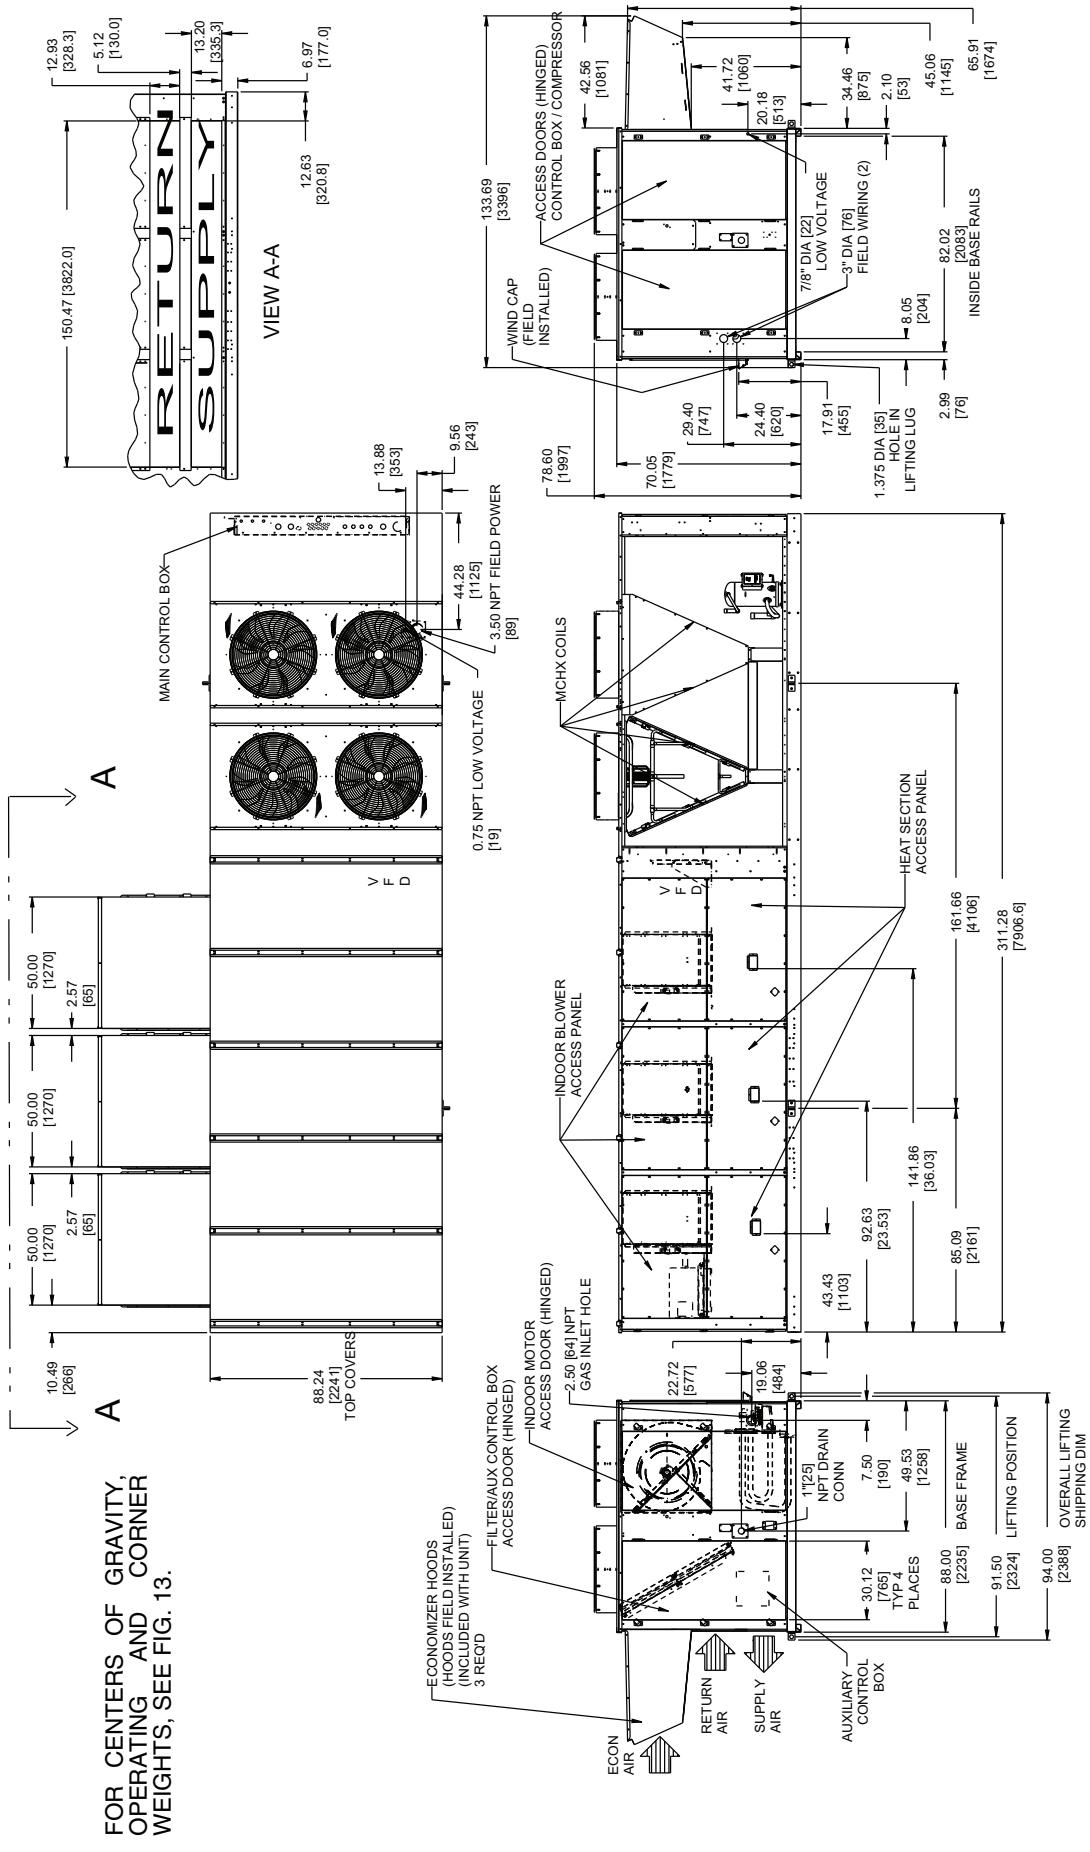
Base Unit Dimensions MCHX, Side Supply and Return — 48A4,A5060
